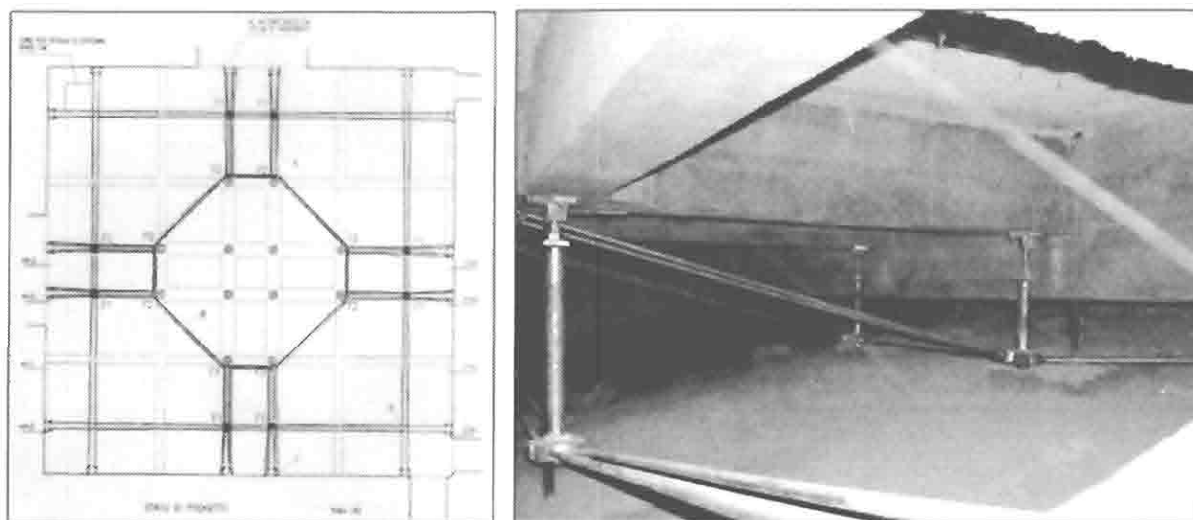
The 1996 active steel cable solution; a) scheme of stainless steel cables ; b) Detail of the telescopic struts
